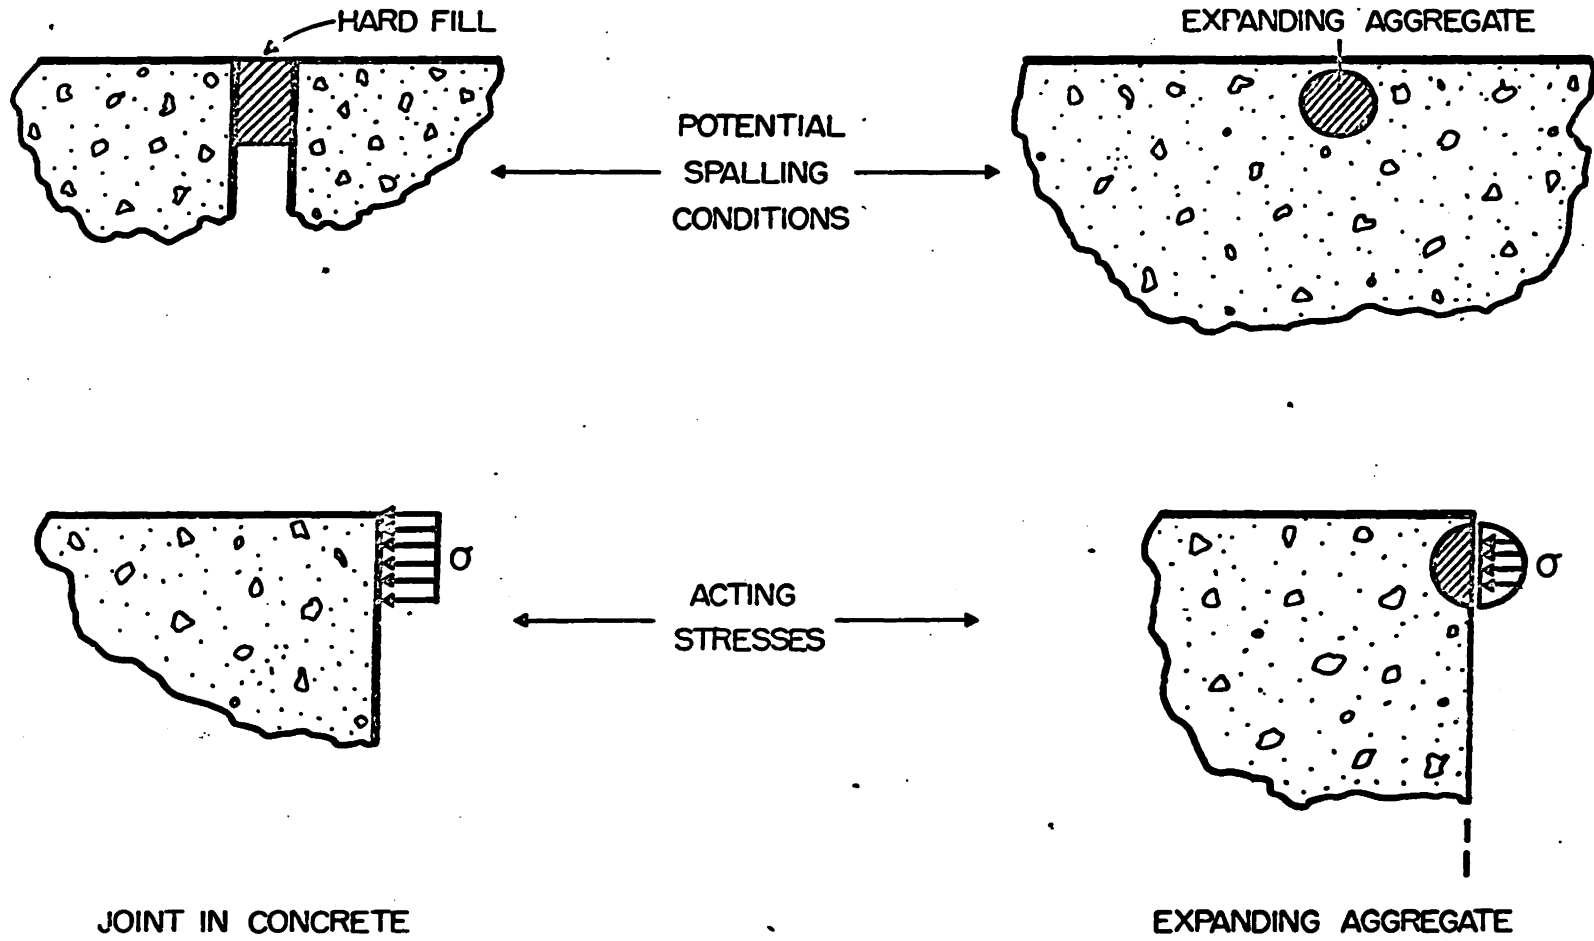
POTENTIAL SPALLING CONDITIONS IN CONCRETE
